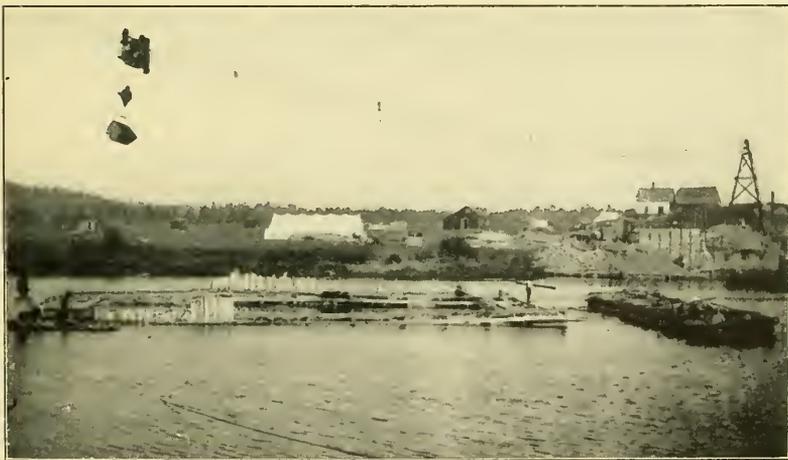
BUILDING COFFER-DAM OF PIER 3, SHOWING CABLEWAY.
